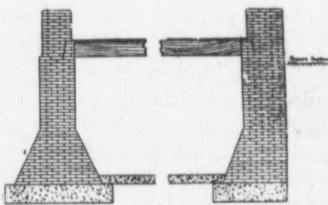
The two types of spread footings—a development of the dwelling house foundation—suitable for buildings up to seven or eight stories
